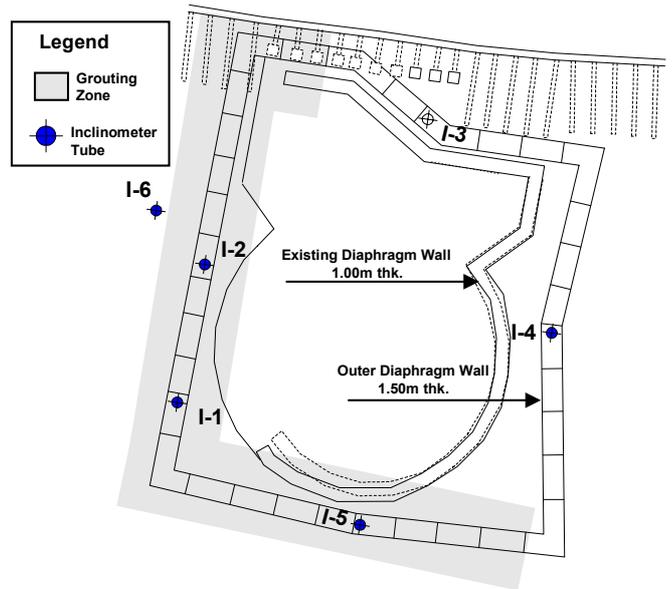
Location of inclinometers and treated area by Jet grouting (after EIT 1999)
